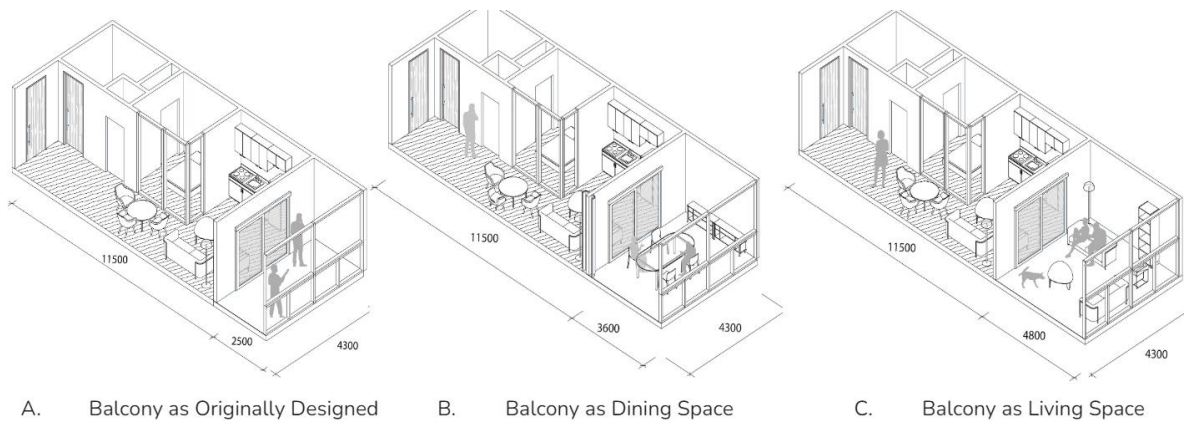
Existing one-bedroom apartment floor plan (left) and updated plan (center and right) when the balcony size is modified to accommodate a living and dining space.
